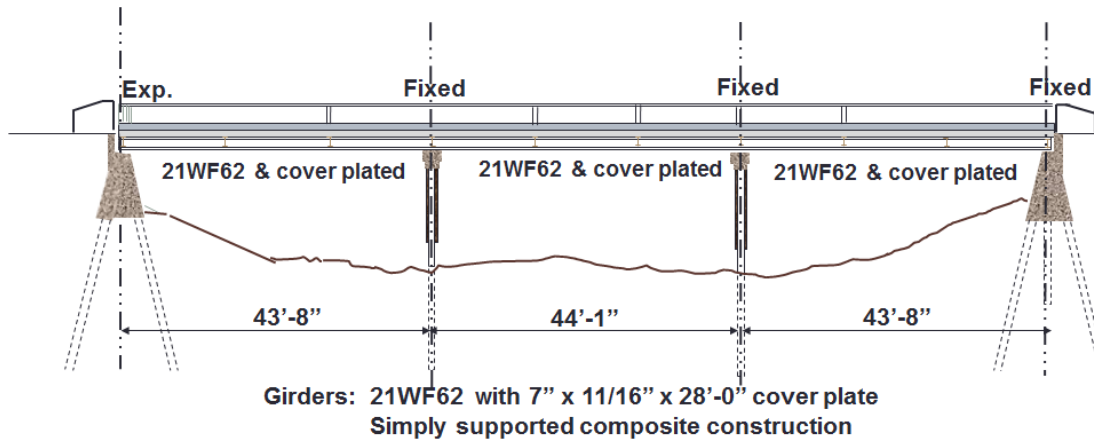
Elevation view of Bridge #0283, Noyes Slough Bridge
